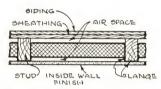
Blanket Insulation In Frame Wall with Flanges Folded to Provide Air Spaces
